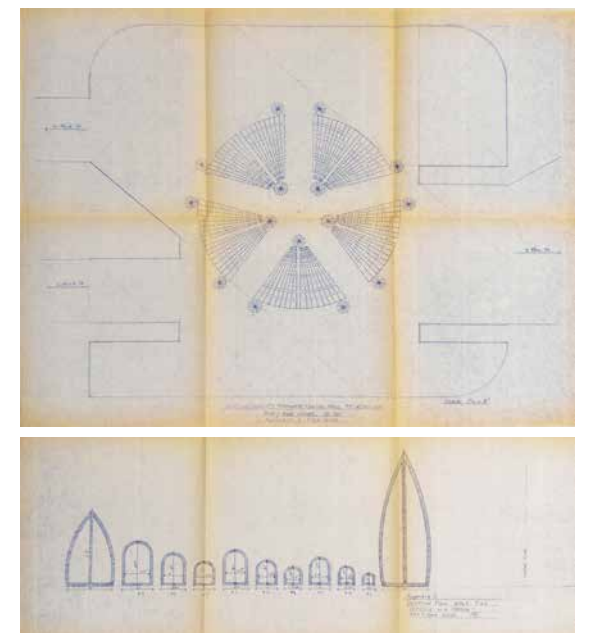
Mary Ann Unger, *Paradise as a Garden*, Floor and Elevation Plans, 1981.
